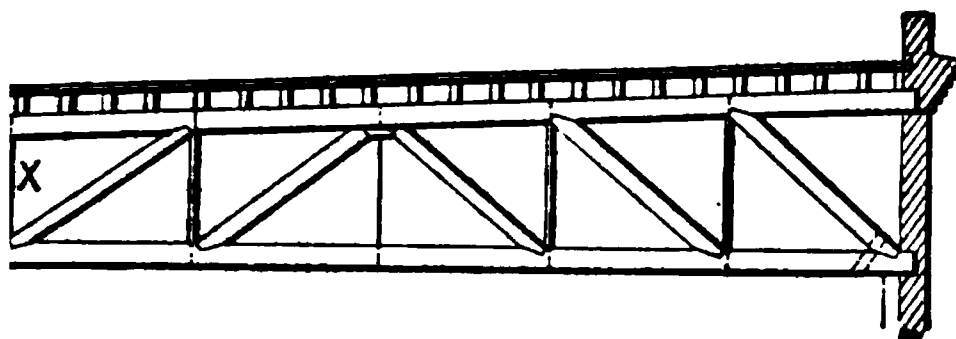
Six-panel Howe Truss with Top Chord Inclined
